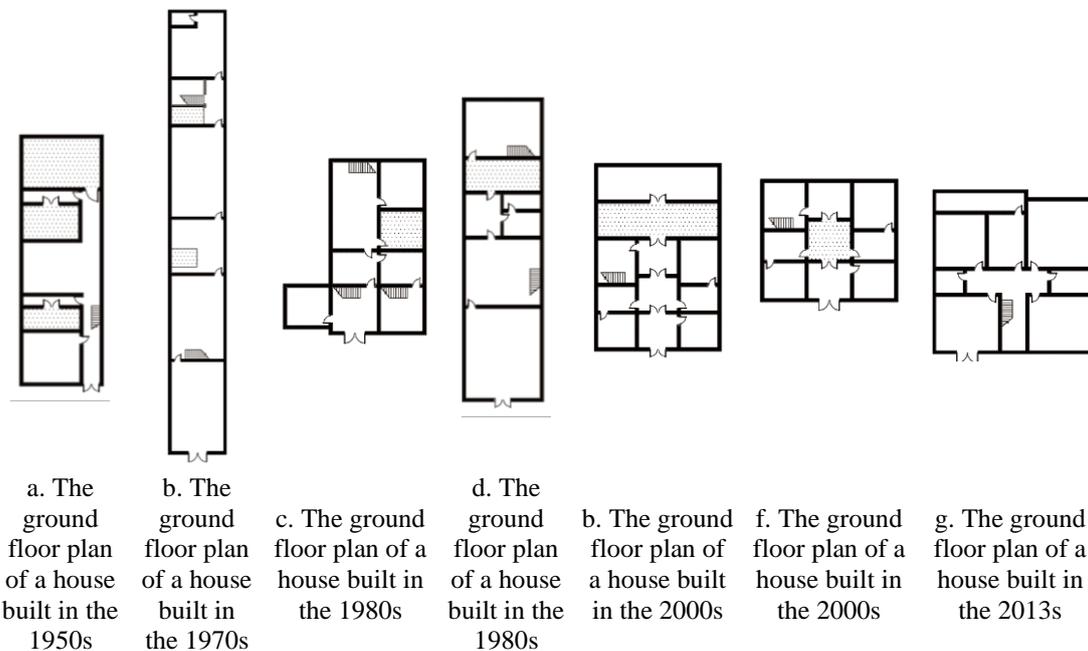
Typical ground floor plans of residences in different periods surveyed in Luzhangwan village
